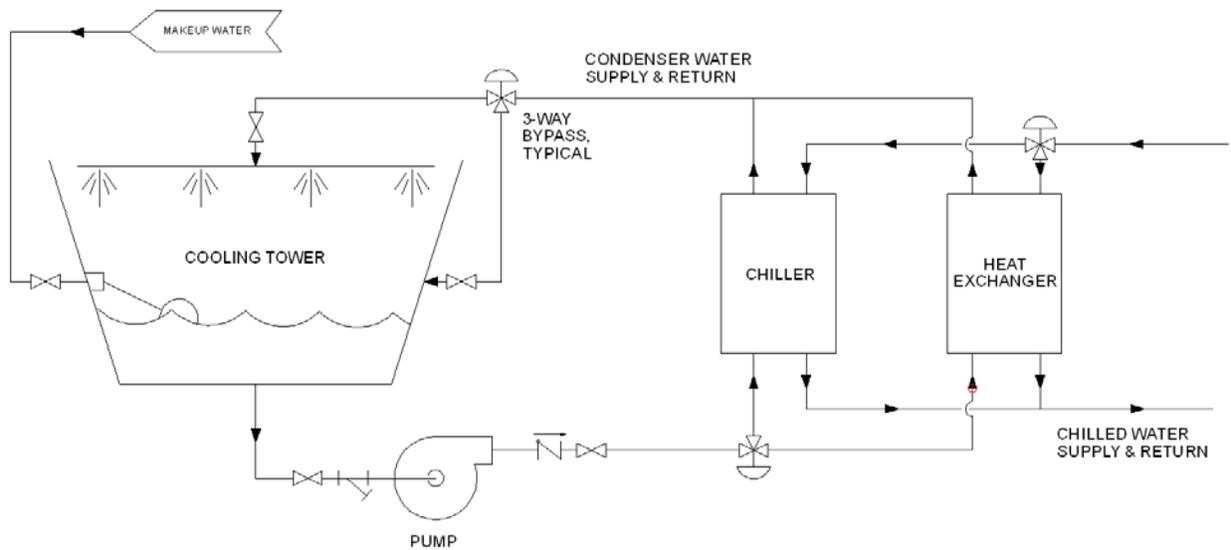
HVAC Cooling Tower Application: Free Cooling Arrangement
